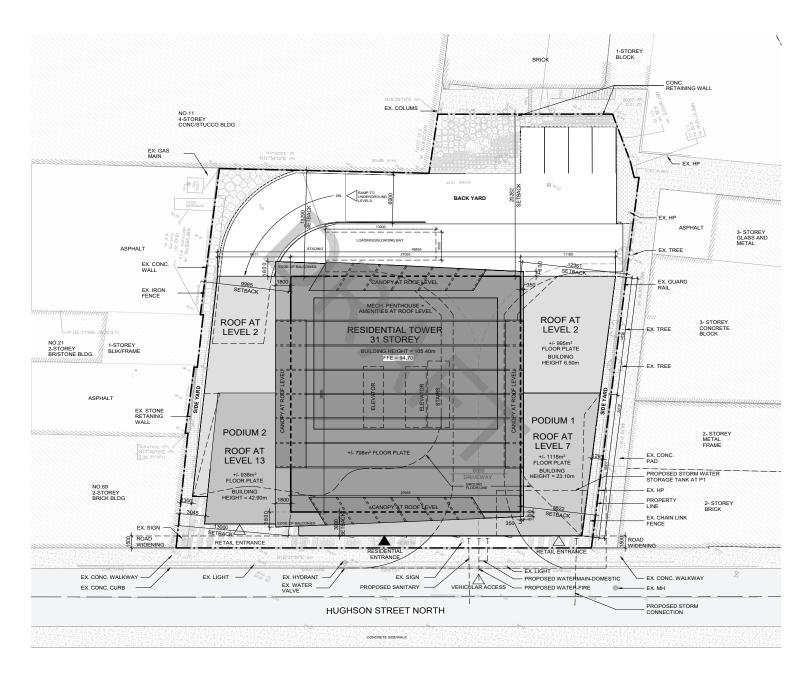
Site Plan for the proposed Development, mcCallumSather Architects, June 2023
